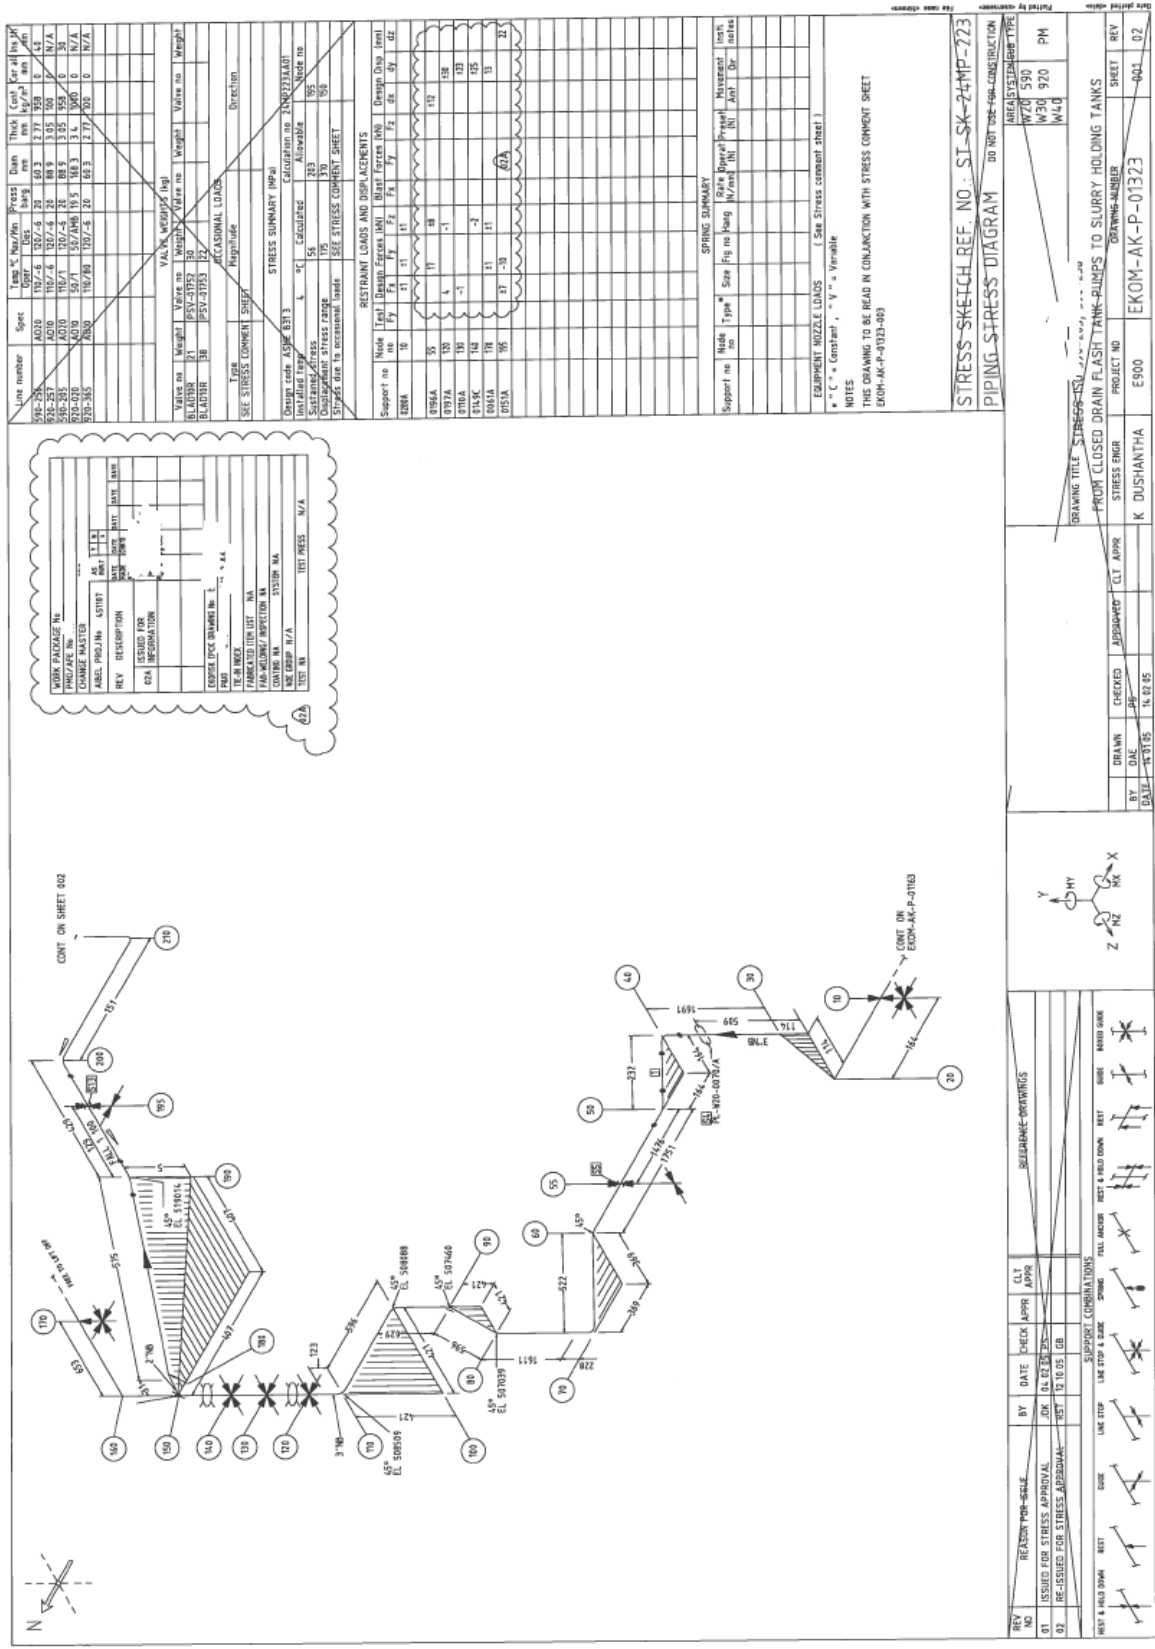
Pipe stress isometric drawing of the Slurry system in Mud Handling system sheet 4 of 6
